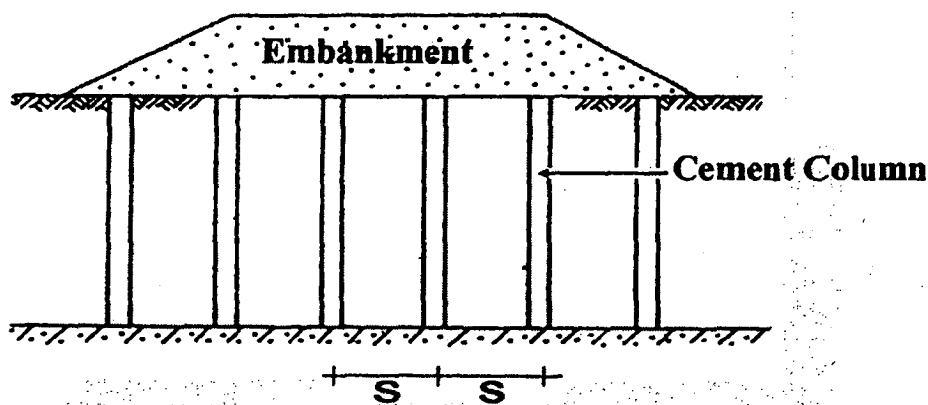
cement columns under an embankment (Swerod, 1992)
